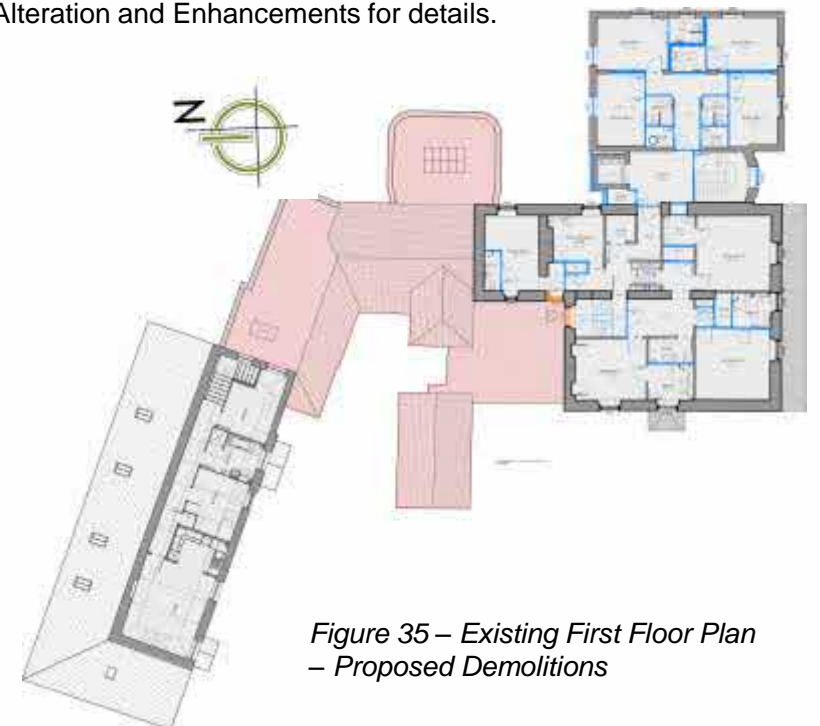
Existing First Floor Plan – Proposed Demolitions
